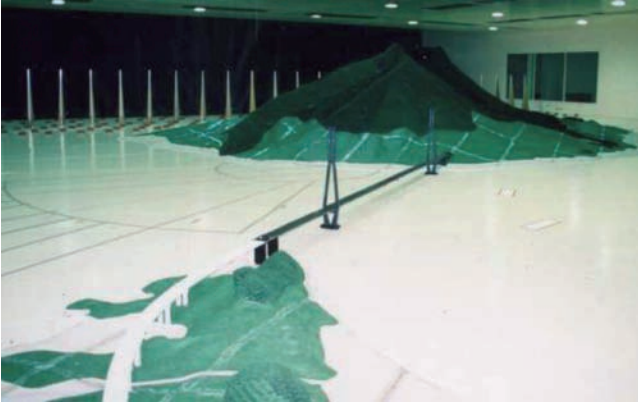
Tatara Bridge. Reduced scale model testing of the whole bridge.
